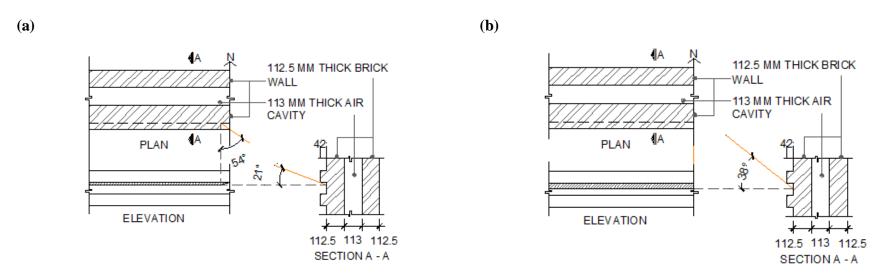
Shaded wall area for one brick course of south wall on 22nd December (a) At 0800/1600 hours (b) At 1200 hours
